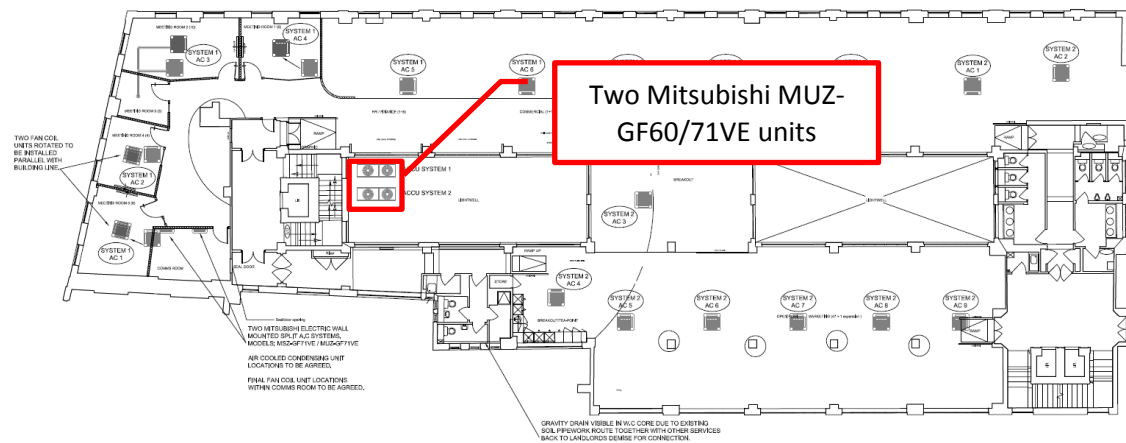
Floor plan showing proposed location for the new condenser units (north is to the left)
